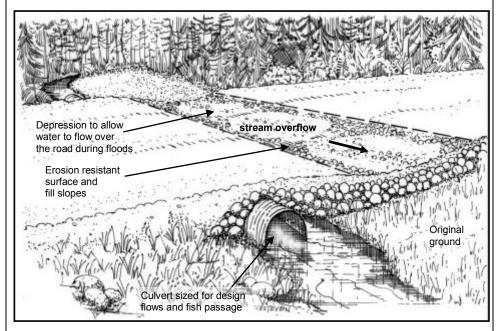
A depression beside the culvert allows water to spill over the road in the event of a flood or culvert blockage (Illustration by Kestevan Design).
